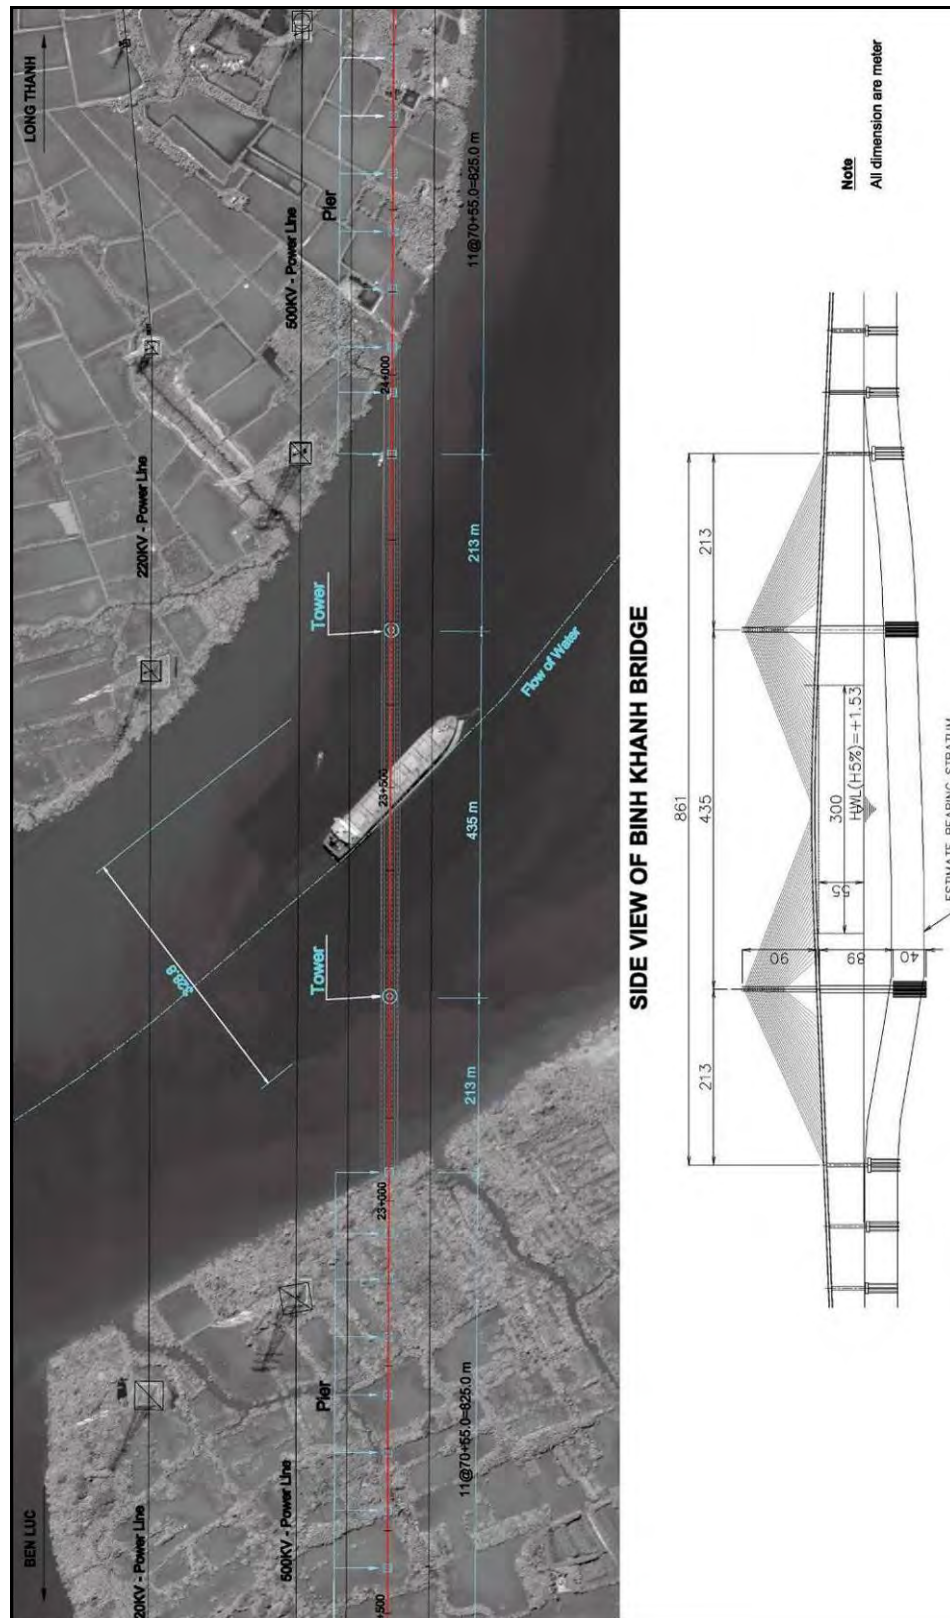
Layout of Binh Khanh Cable Stay Bridge
